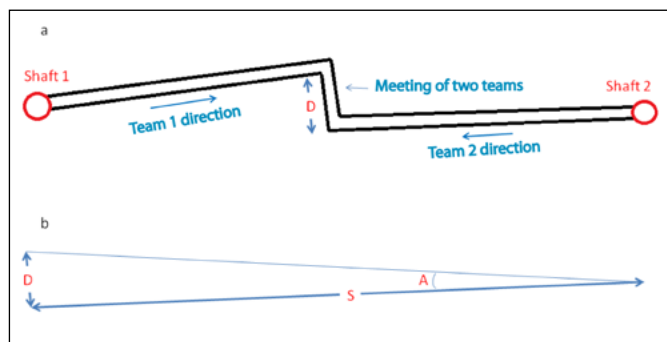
(a) schematic plan of a theoretic tunnel segment between two shafts, S (m) apart. From the bottom of each shaft a team of excavators hewed the tunnel towards each other, with a final deviation of D (m) close to the meeting place, where acoustic communication was used to rectify the deviation. (b) Schematic representation of the angular deviation A: $A = \arctg D/S$.
